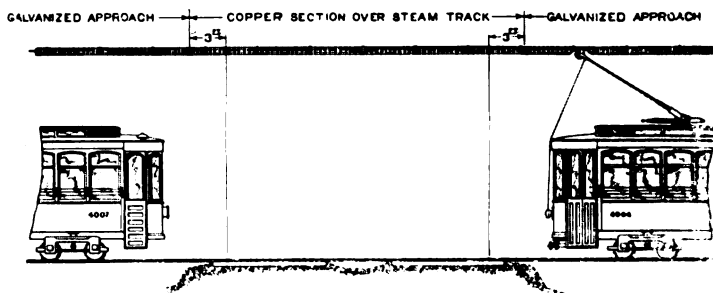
Showing Copper Section over Steam Road Tracks and Galvanized Approaches
